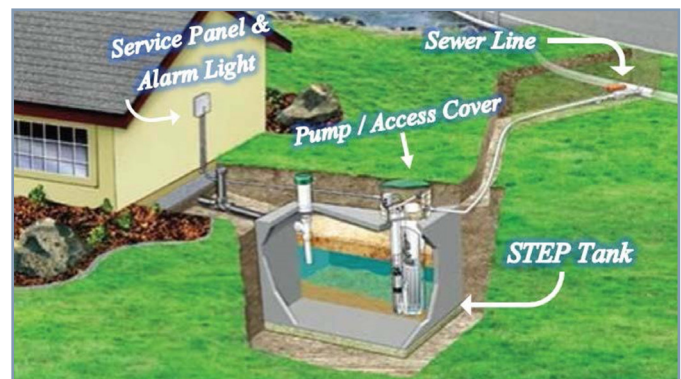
Example of a STEP sewer system. Image provided by Tom Faye, City of Lacey, Washington.
